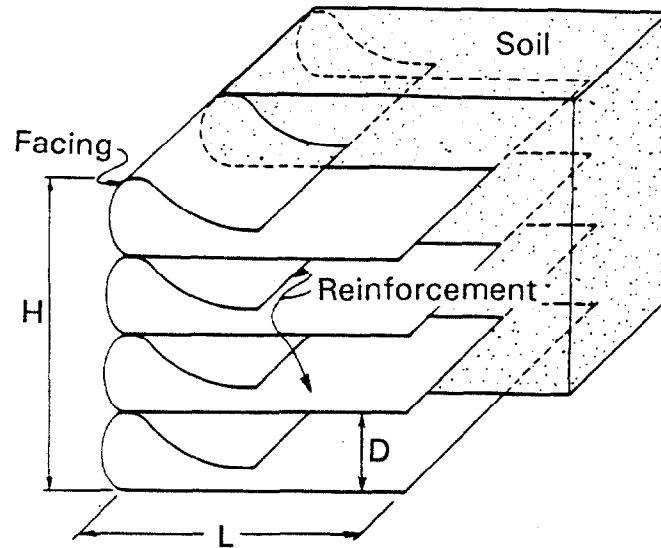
Schematic diagram of a reinforced soil wall using geotextile sheet reinforcement.<sup>(6)</sup>
